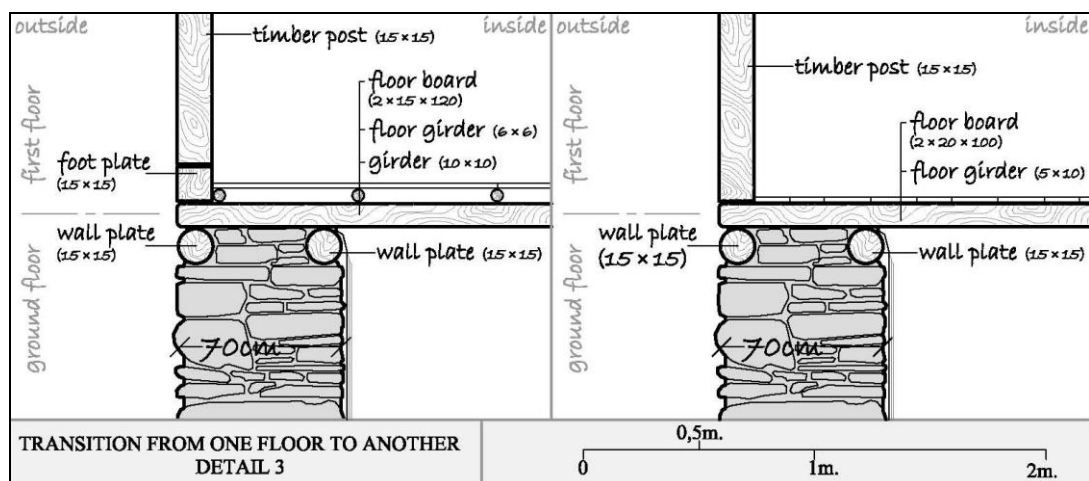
, Detail of use of masonry wall in the lower floor and timber post in the upper floor; use of girder and floor girders together at floor change (left), use of only floor girders at floor change (right)
